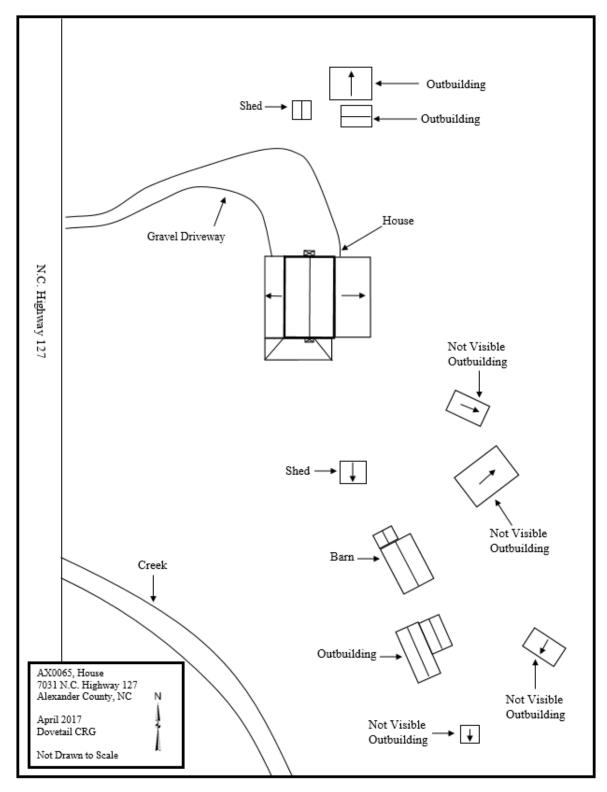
Site Plan for House at 7031 N.C. Highway 127 (AX0065).
